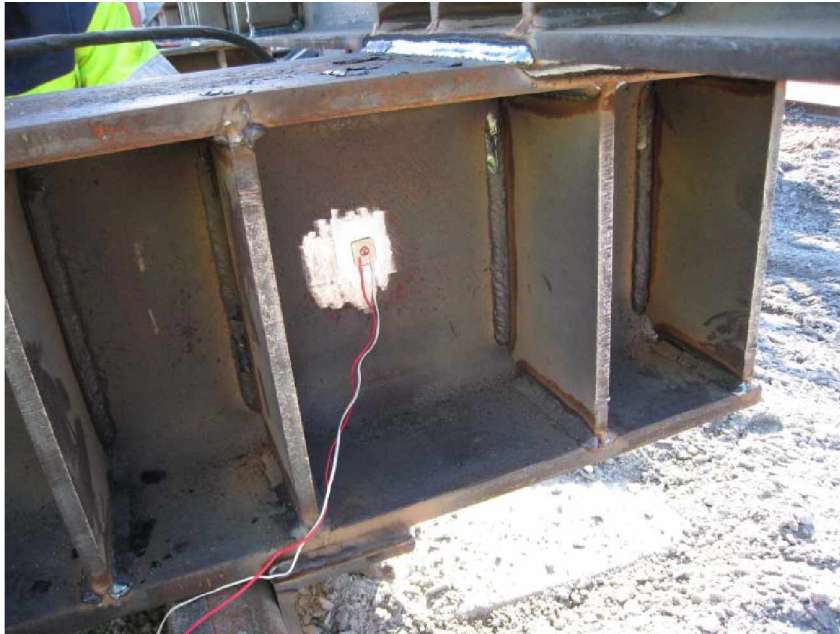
Instrumented beam. Note the stiffening plates needed to avoid buckling of the beam web. (Lehtonen 2010 p. 55)
